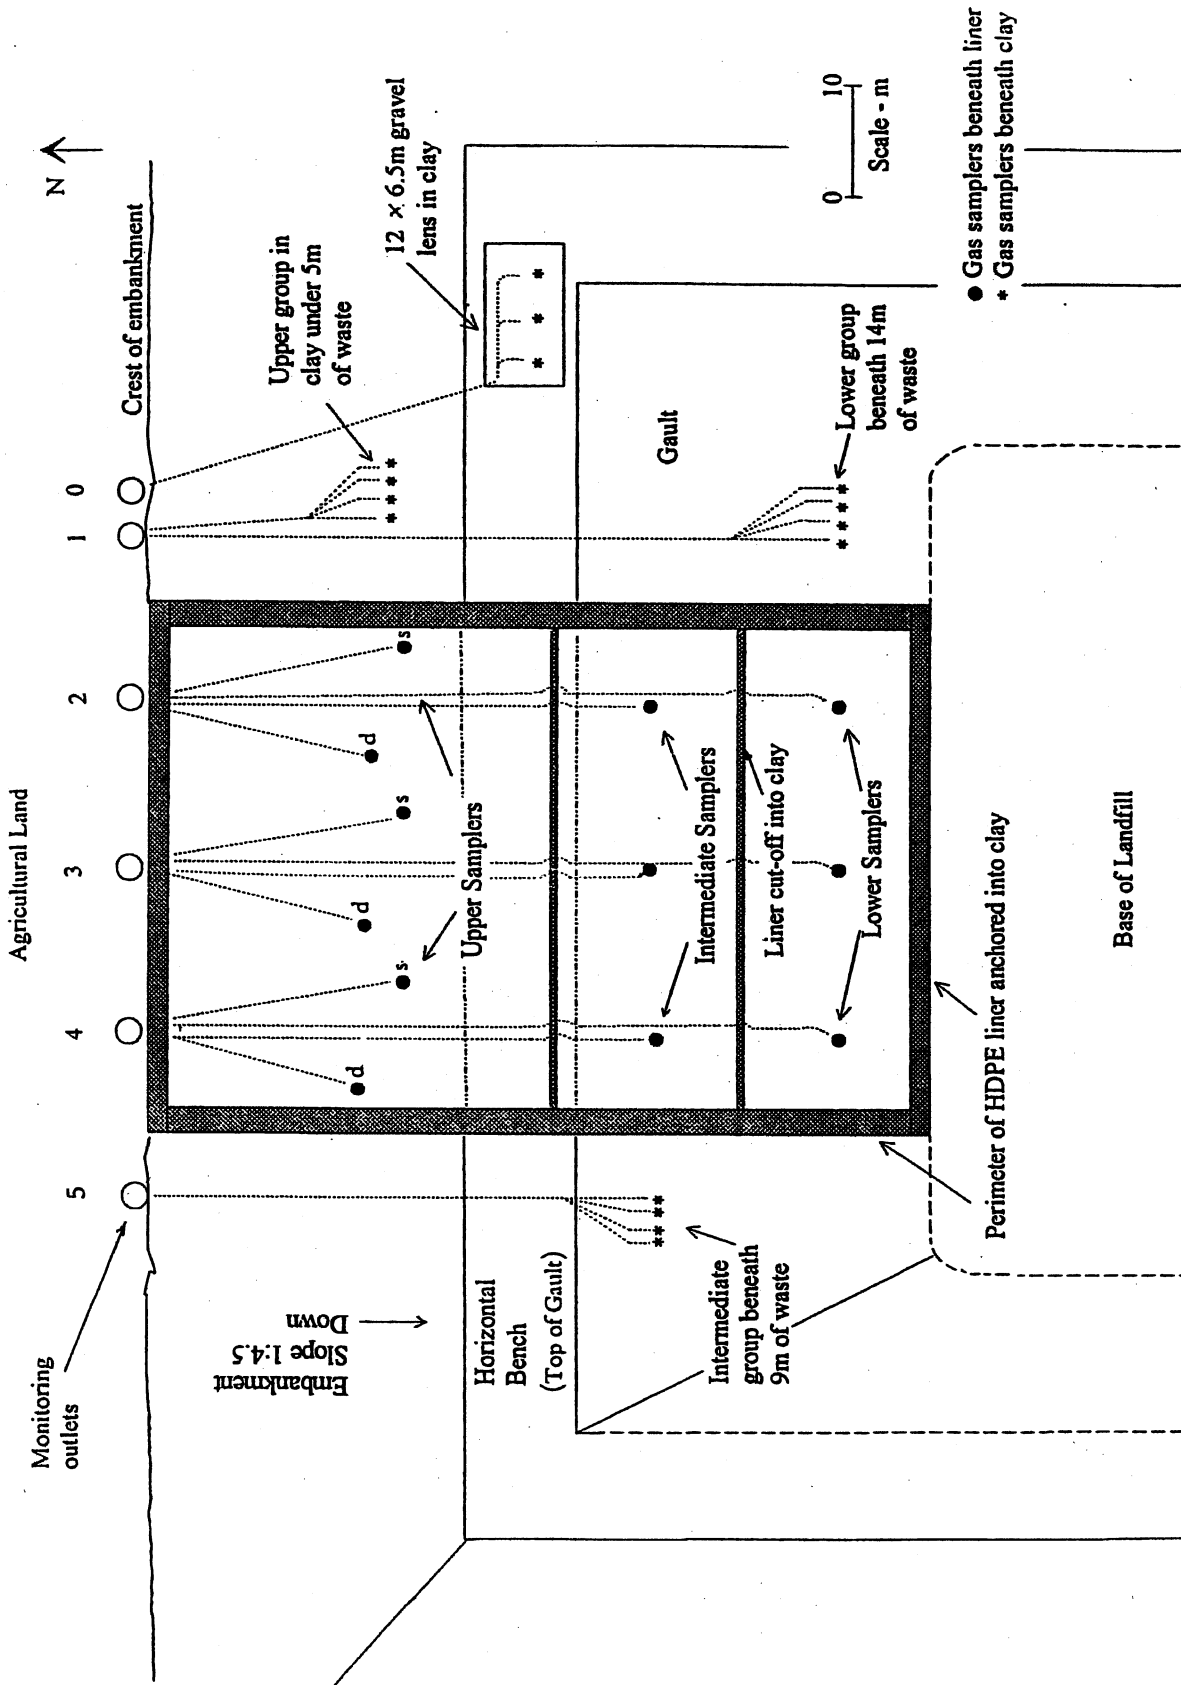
Plan of HDPE liner and gas samplers beneath liner and clay.
